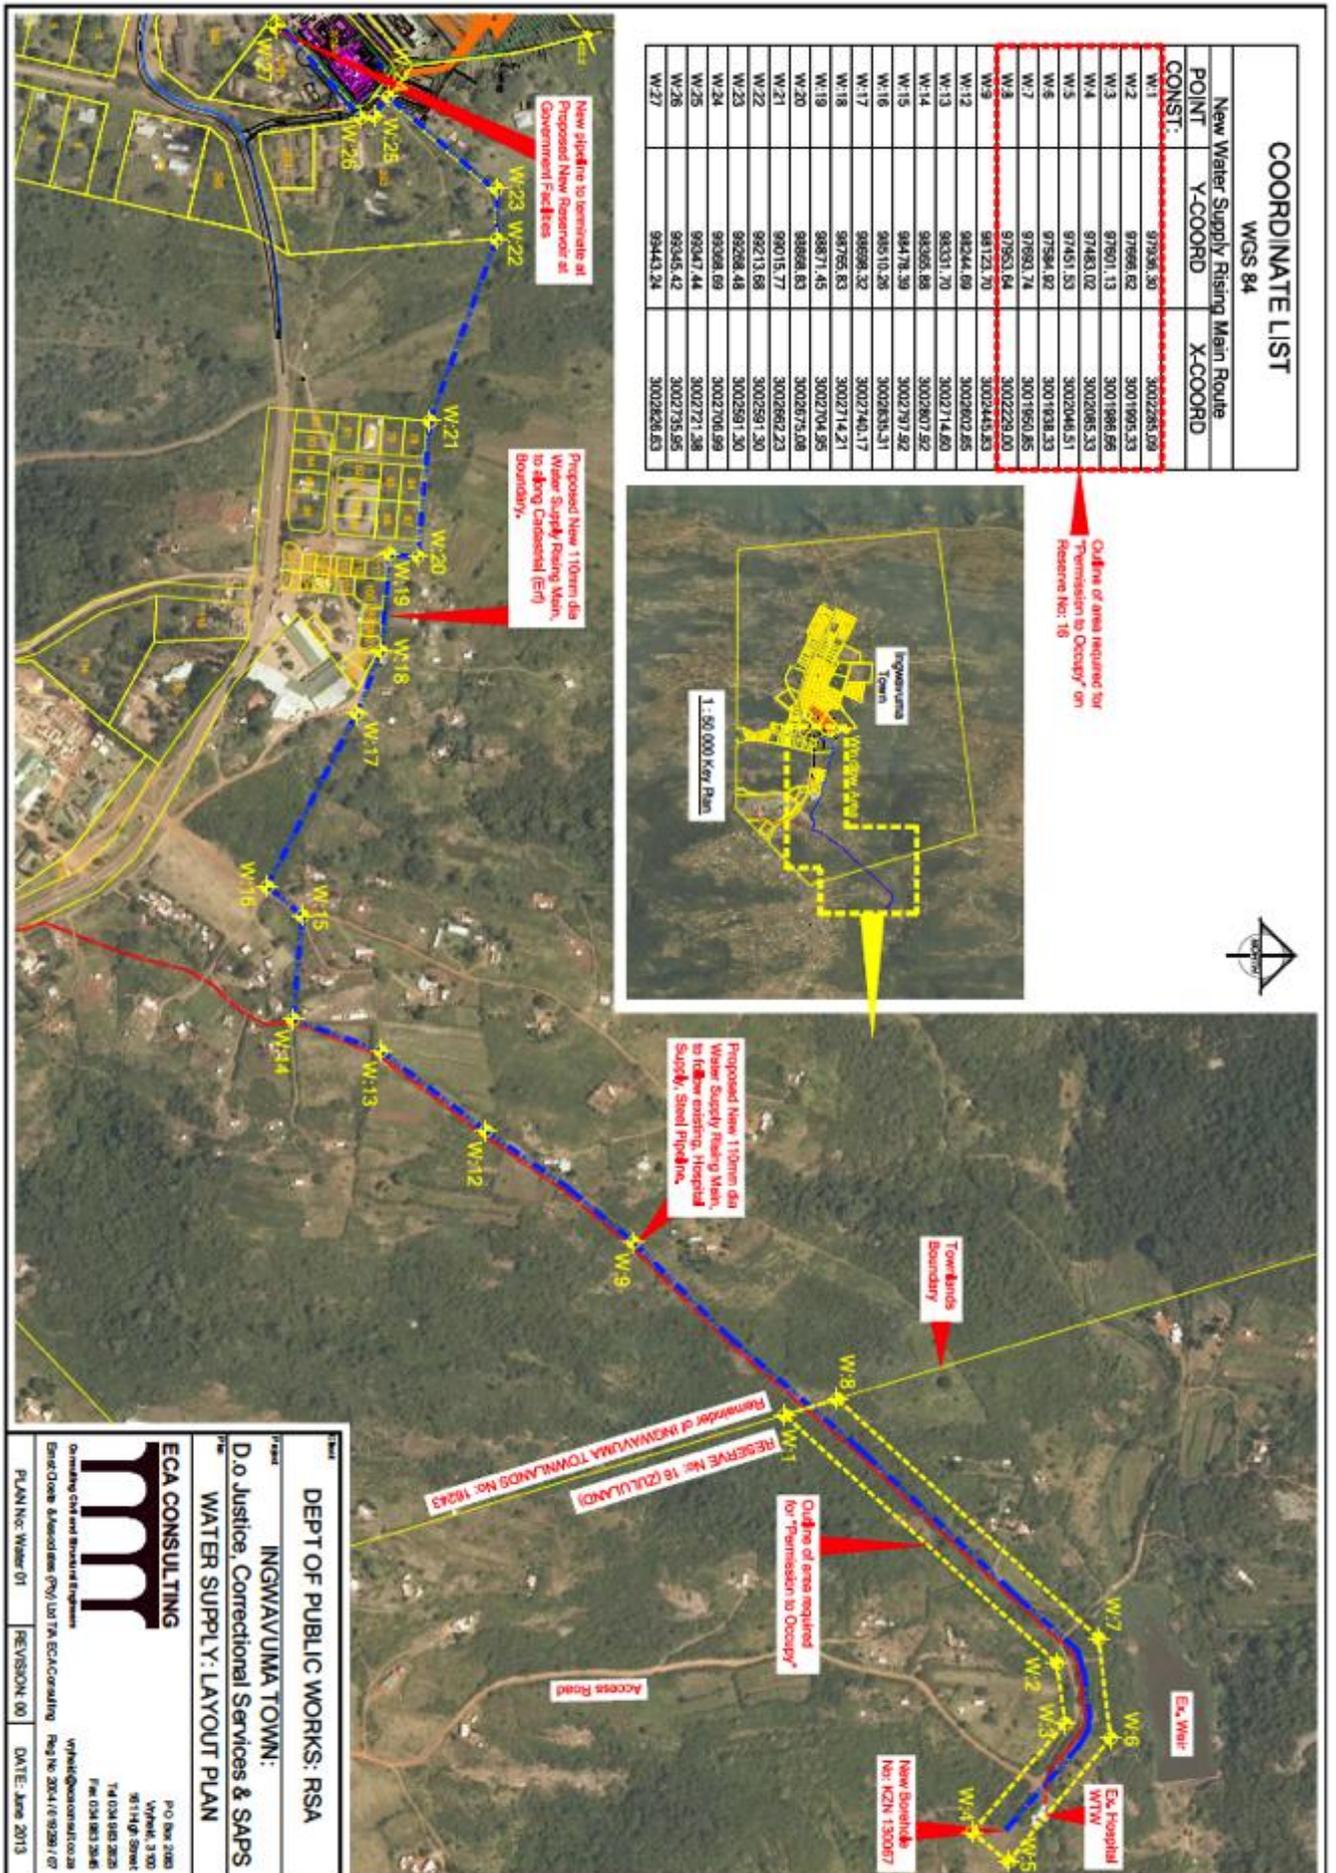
Layout Plan of the proposed Water Pipeline traversing from proposed borehole site to Government facilities in Ingwavuma Town to the west.
